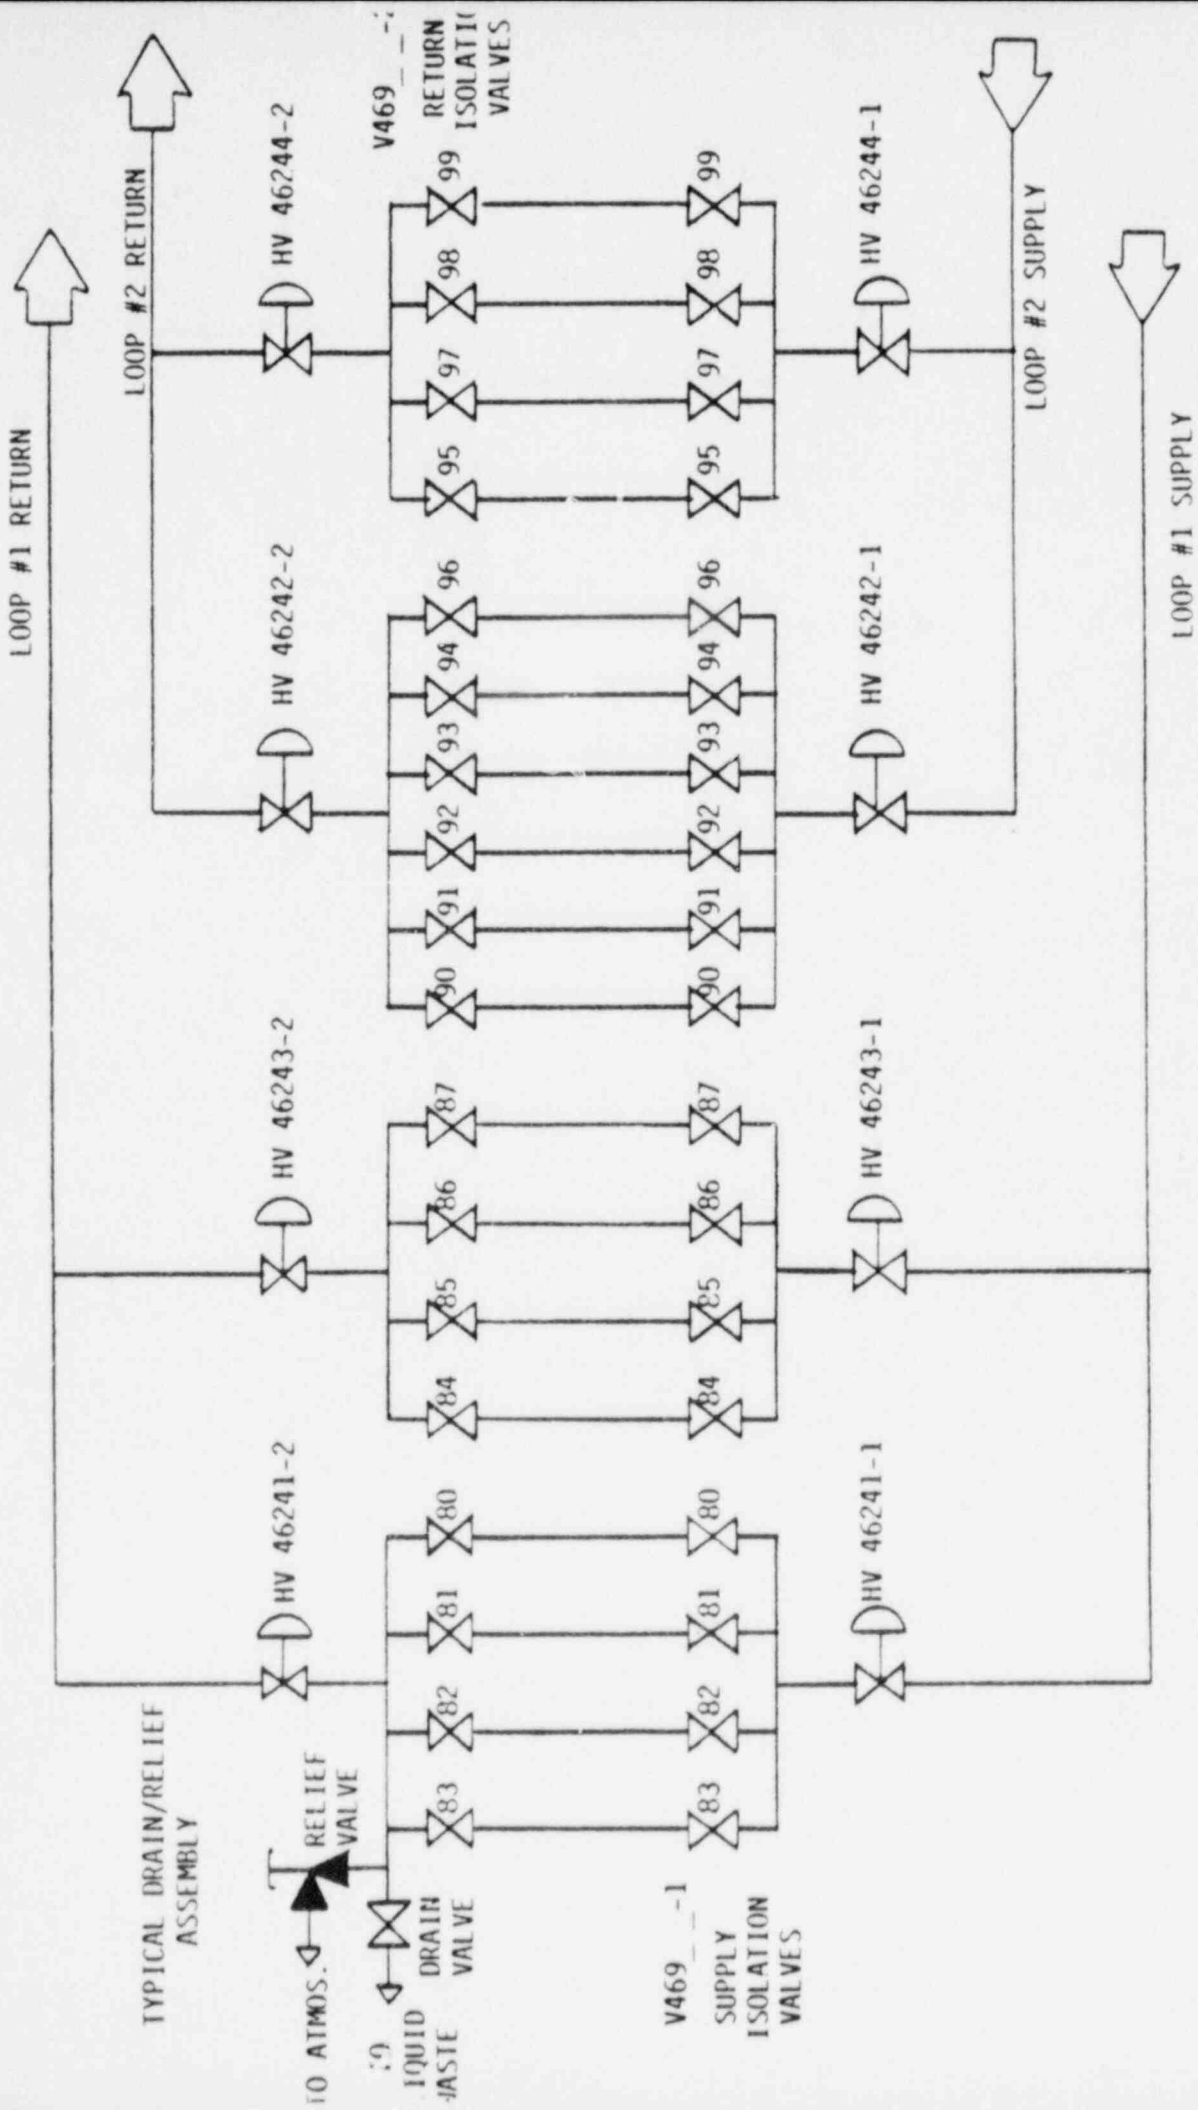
CORE SUPPORT FLOOR/COLUMN VENT SYSTEM
